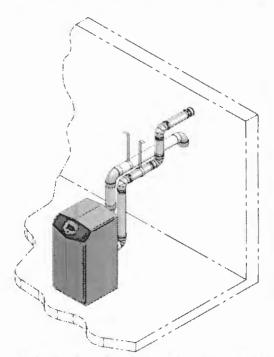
Stainless Steel Two-Pipe - See page 22 for more details
